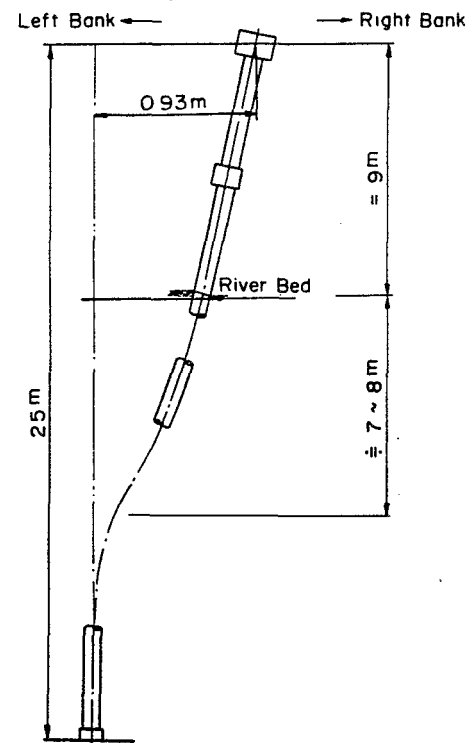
Deformation of a steel pipe pile under Pier No. 4 of Showa Bridge in 1964 Niigata, Japan earthquake (Hamada, 1992a).
